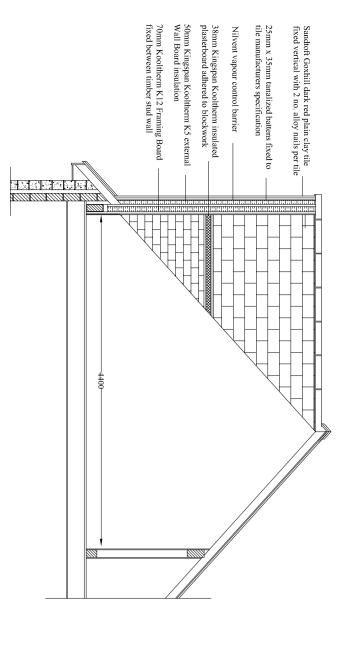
## DETAIL OF MATERIAL USED IN BUILD-UP OF DORMER WALLS ("U" value of external walls to achieve $0.18 \mathrm{W/m2K}$ )
